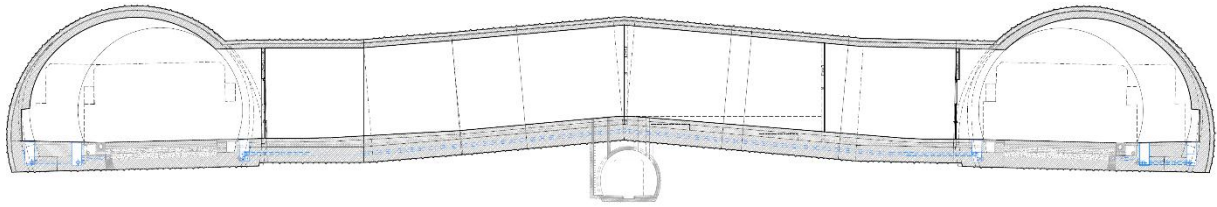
Longitudinal section of cross connection No. 1, drainage tunnel is directly below the cross connection
